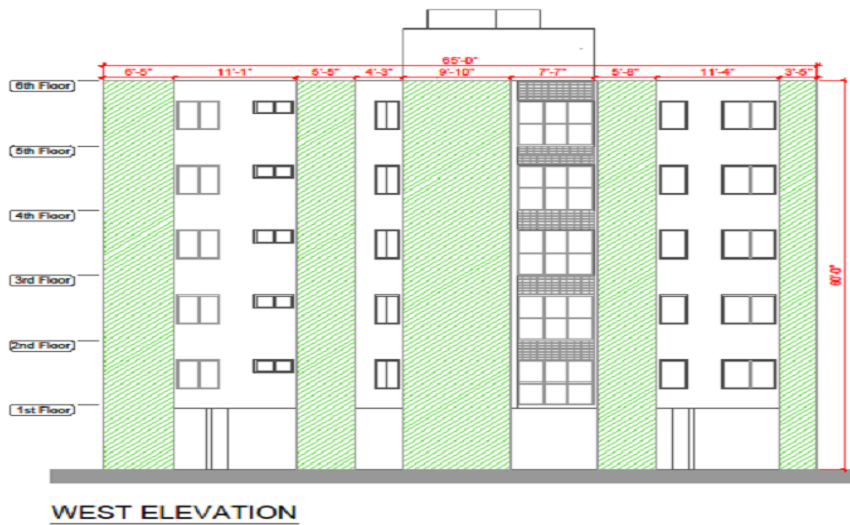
(b): Sketch of a typical building in a typical canopy of Shiddeshwari Ward (east and west elevations).
